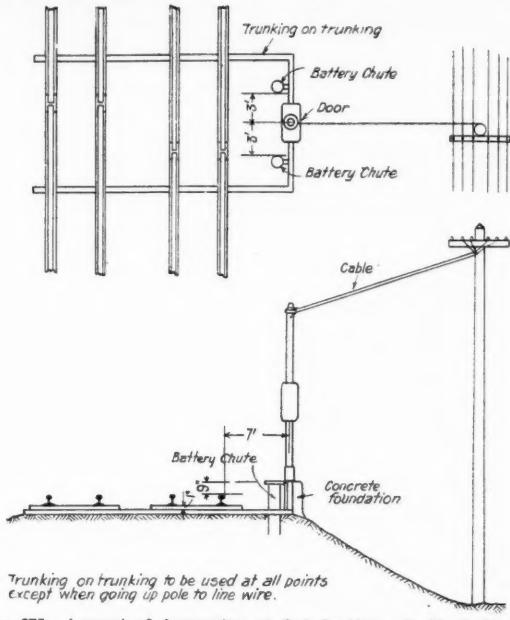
Layout of Apparatus at Cut Section. C. M. & St. P.
